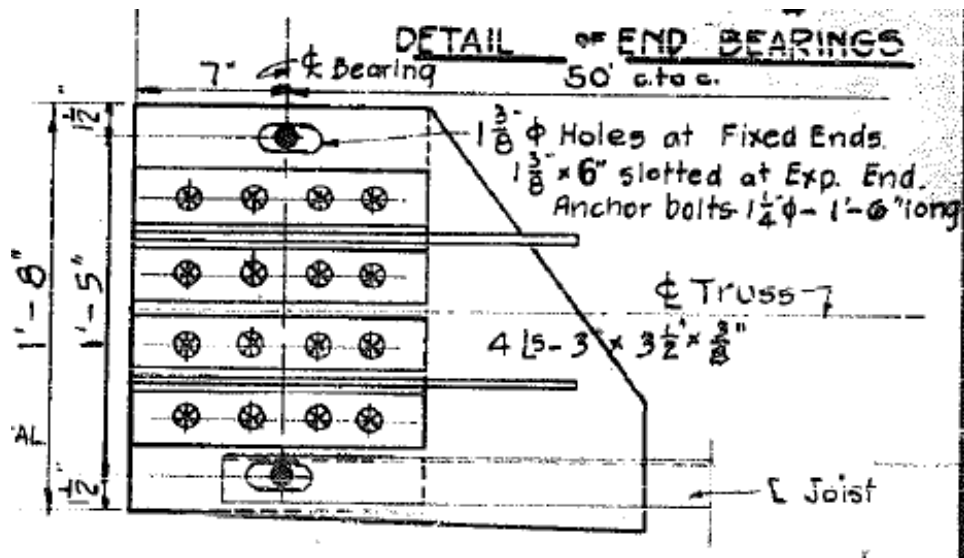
1915 standard Warren truss bridge plan showing slotted bolt detail typical on shorter truss bridges between 1914 and 1926. Plan sheet courtesy of WisDOT.
